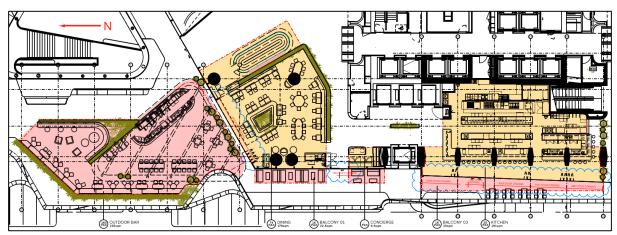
Proposed indoor and outdoor areas for the food and drink premises use, with outdoor areas in pink shading and indoor areas in yellow shading. 160 patrons are proposed within the northern outdoor terrace and 32 patrons are proposed within both balcony areas along the western corridor. Areas shown in white are common circulation space, which will be used as trafficable area for the proposed use.
